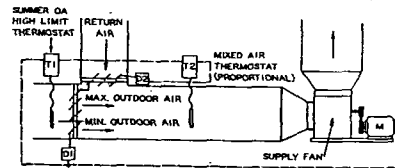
All-Season Ventilation Control With Fixed Minimum Outdoor Air Plus Additional Outdoor Air When Practicable
